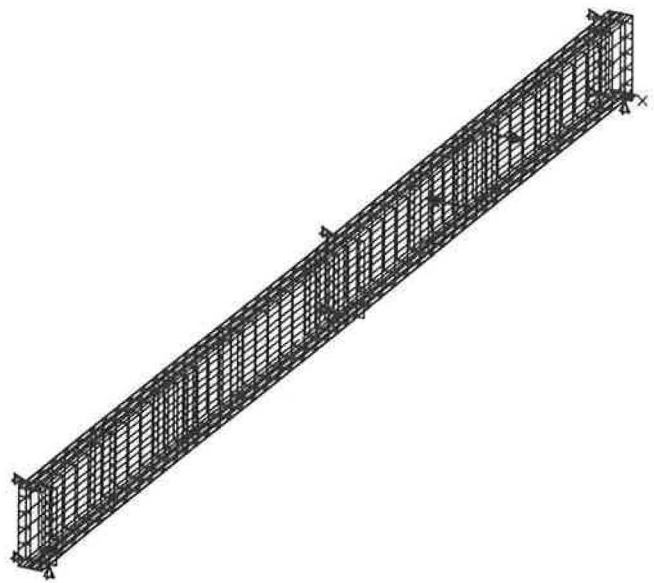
Test girder finite-element model. Torsional loading at north quarter-point end and midspan braces.
